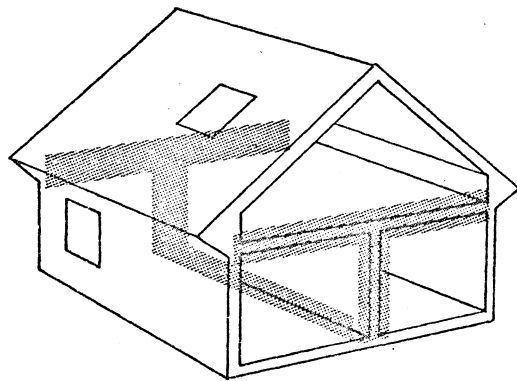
During erection of the frame strips of polyethylene sheet vapour barrier are placed underneath the loadbearing partition wall, between the loadbearing partition wall and the gable wall as well as between the gable wall and the attic floor.
